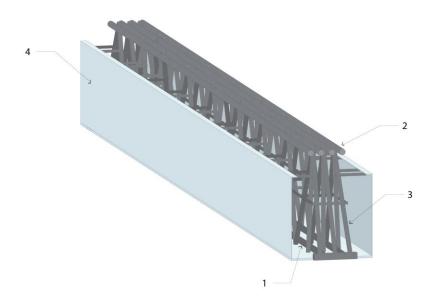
Beams in first phase (see 1.3.1): (1) bottom chord of the truss elements made of a planar or cold formed steel plate, (2) Upper chord of the truss elements, (3) Web diagonal elements, (4) Welded steel plates as formwork for the concrete casting
